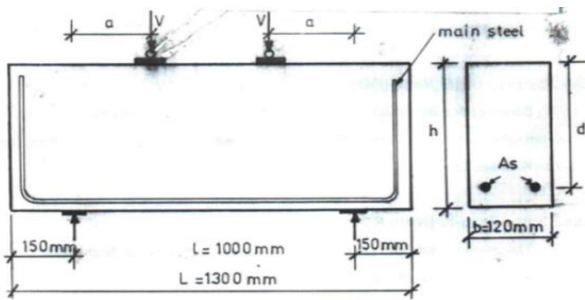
Detail of the crushed stone concrete deep beams without shear Reinforcement
